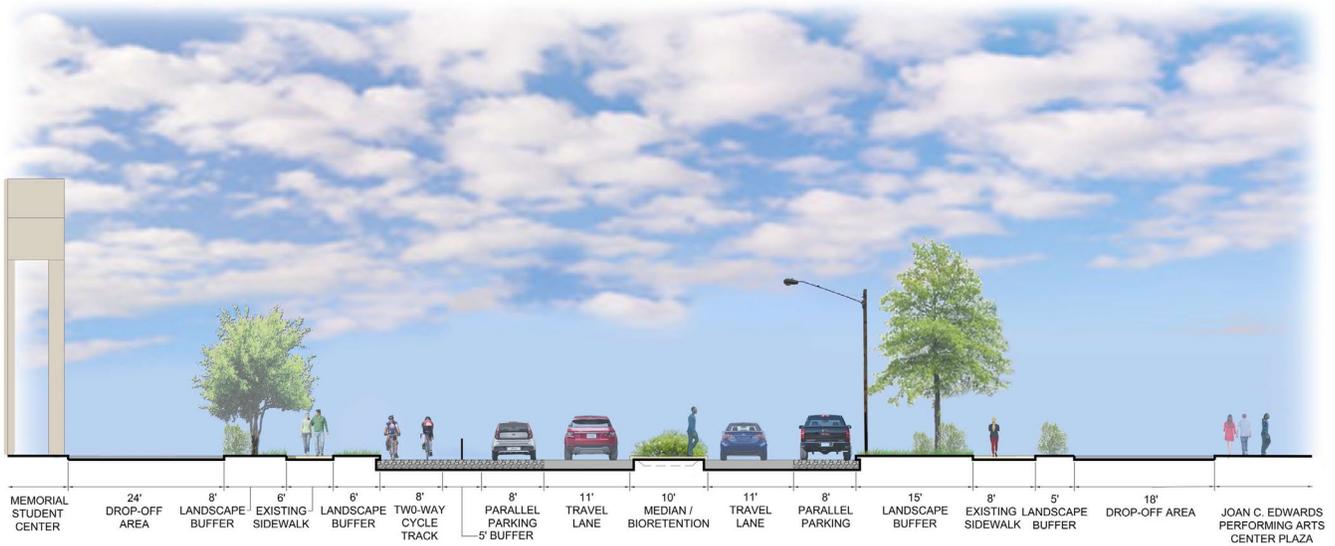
5th Avenue Complete Street (20th Street to 16th Street)
